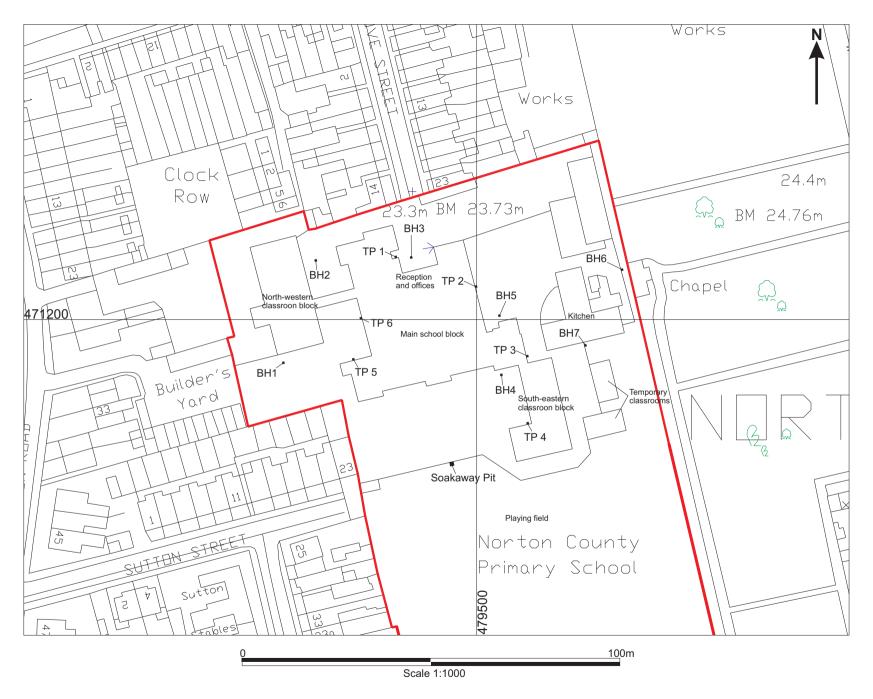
Site plan, showing location of Soakaway Pit, Test Pits (TP) and Boreholes (BH) at scale 1:1000
